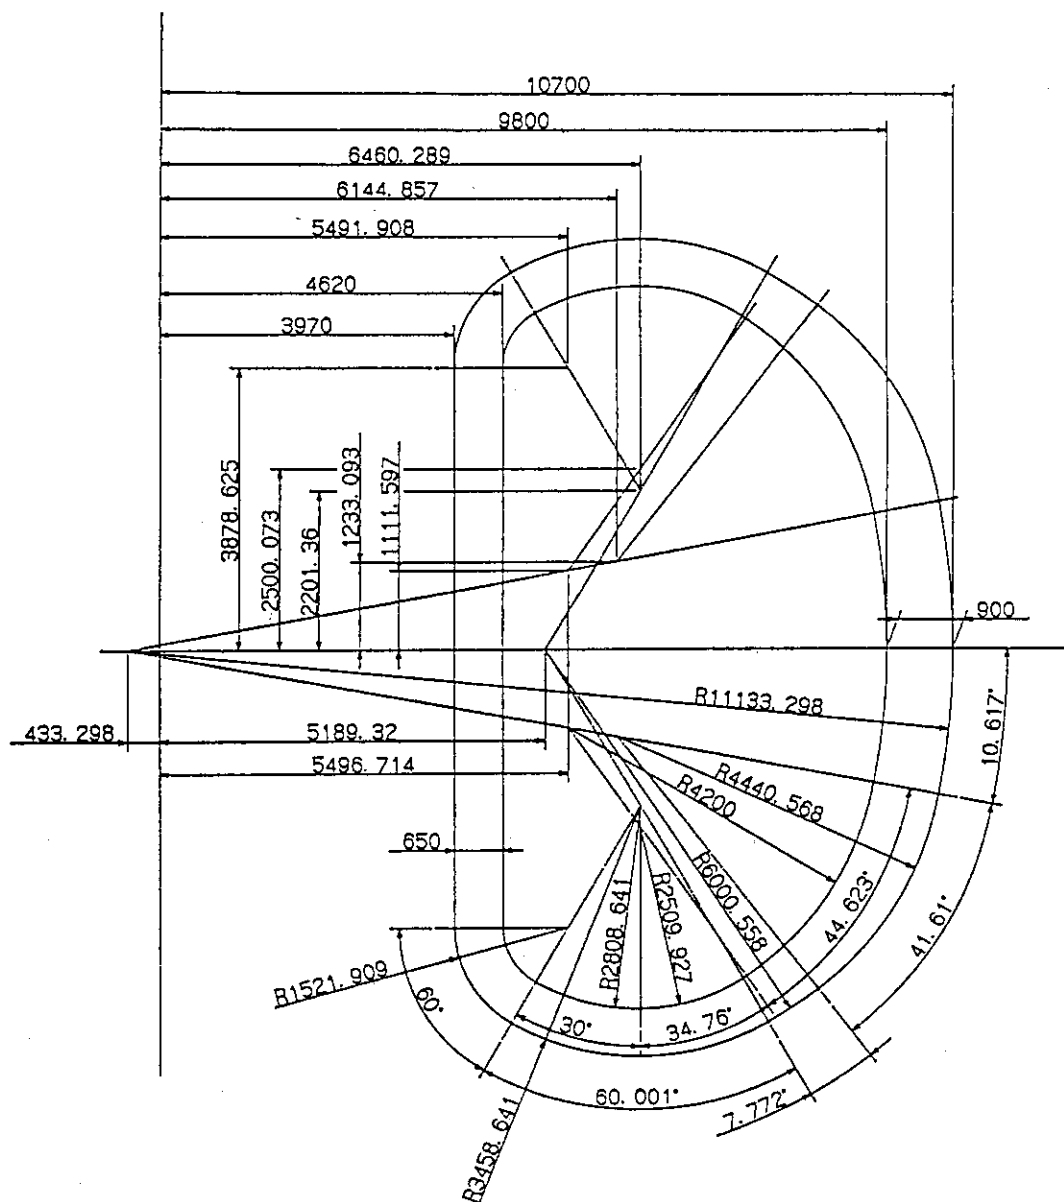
Detail dimension of SSTR vacuum vessel.
